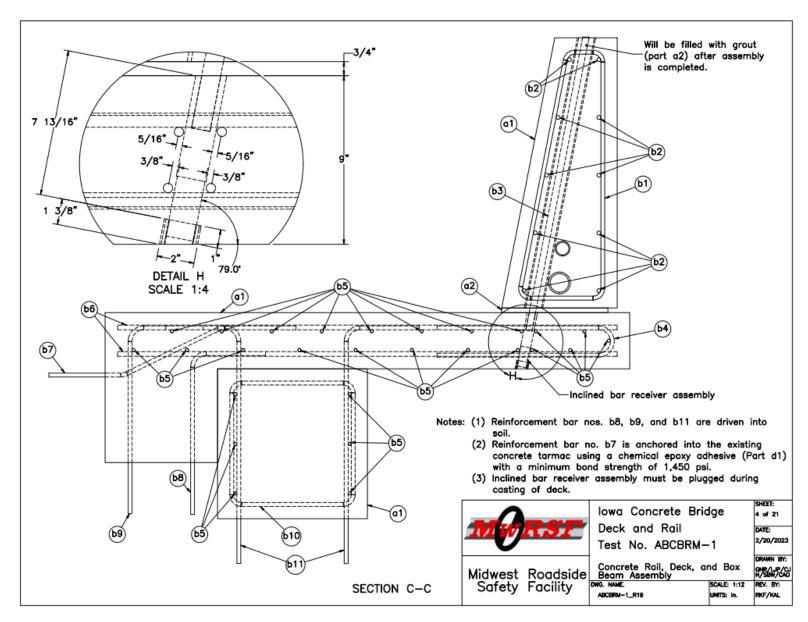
Concrete Rail, Deck, and Box Beam Assembly, Test No. ABCBRM-1
